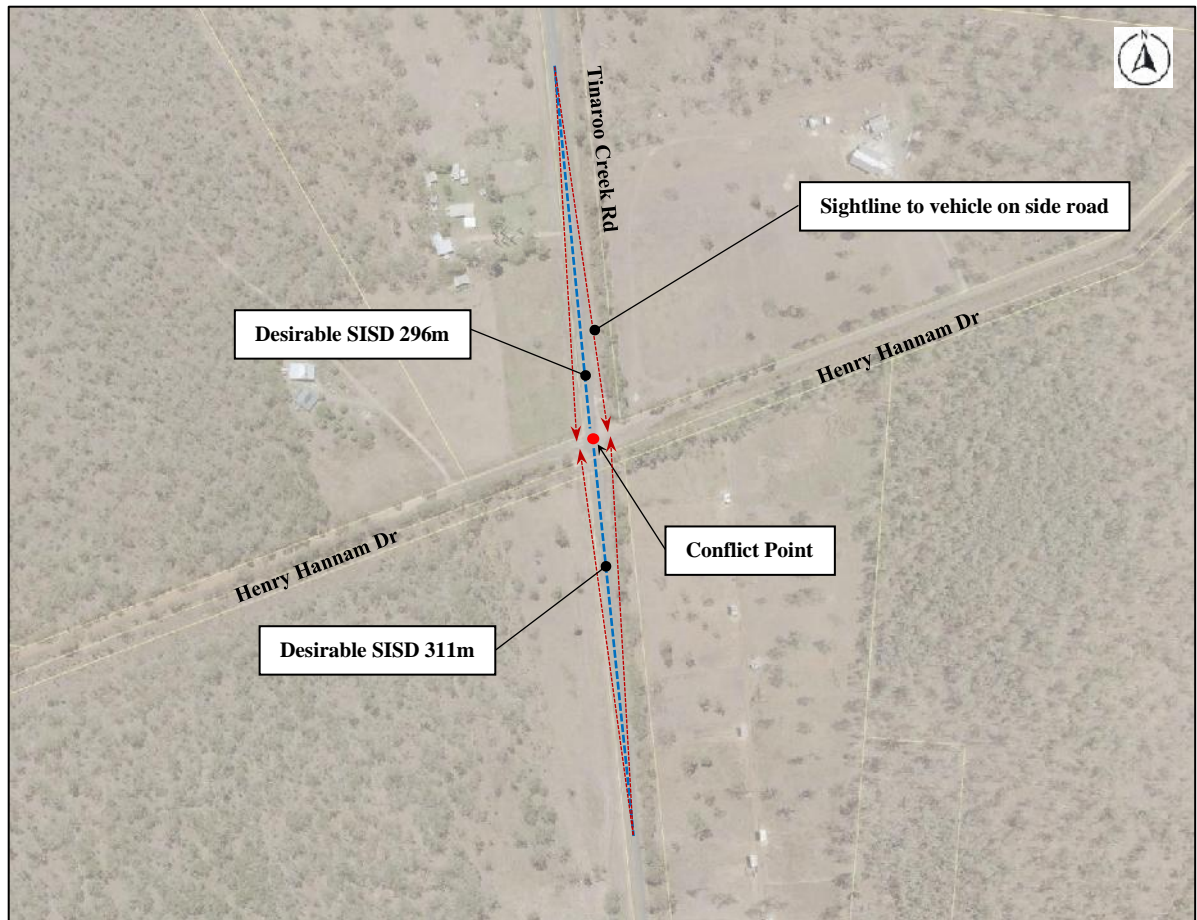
Tinaroo Creek Road/Henry Hannam Drive Intersection - SISK Assessment
